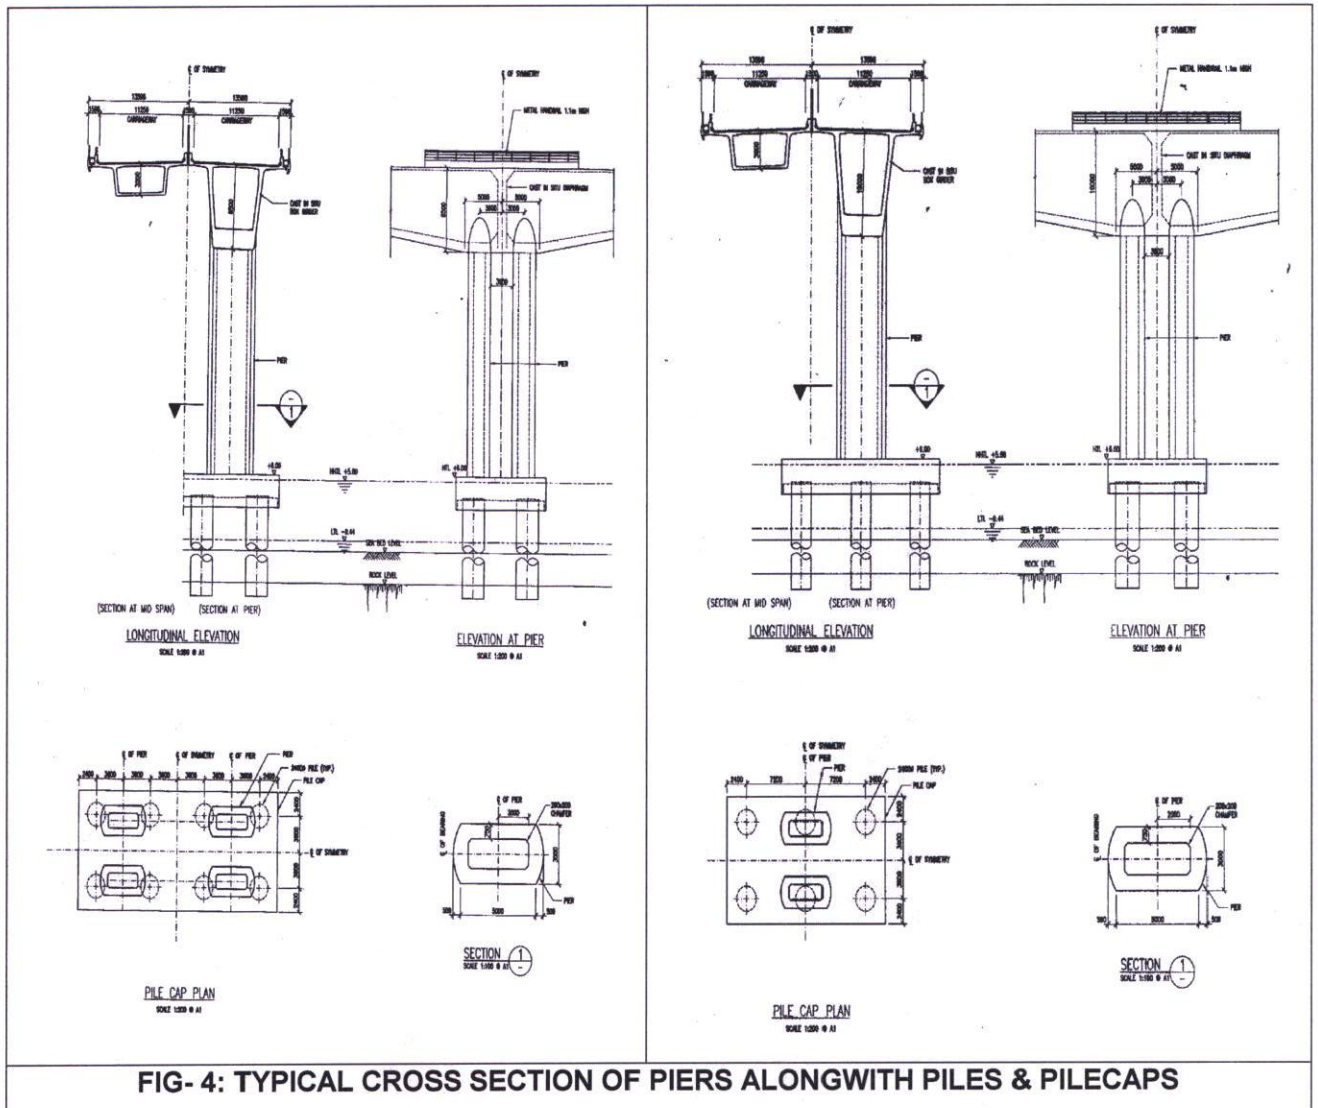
TYPICAL CROSS SECTION OF PIERS ALONGWITH PILES & PILECAPS
